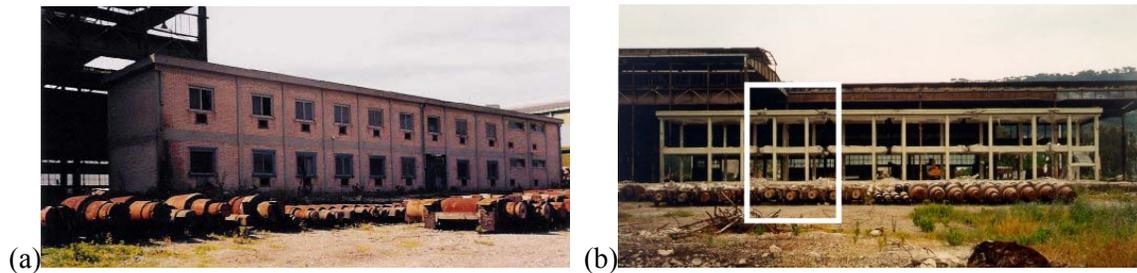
Case study: (a) Original building, (b) Selected structural module
